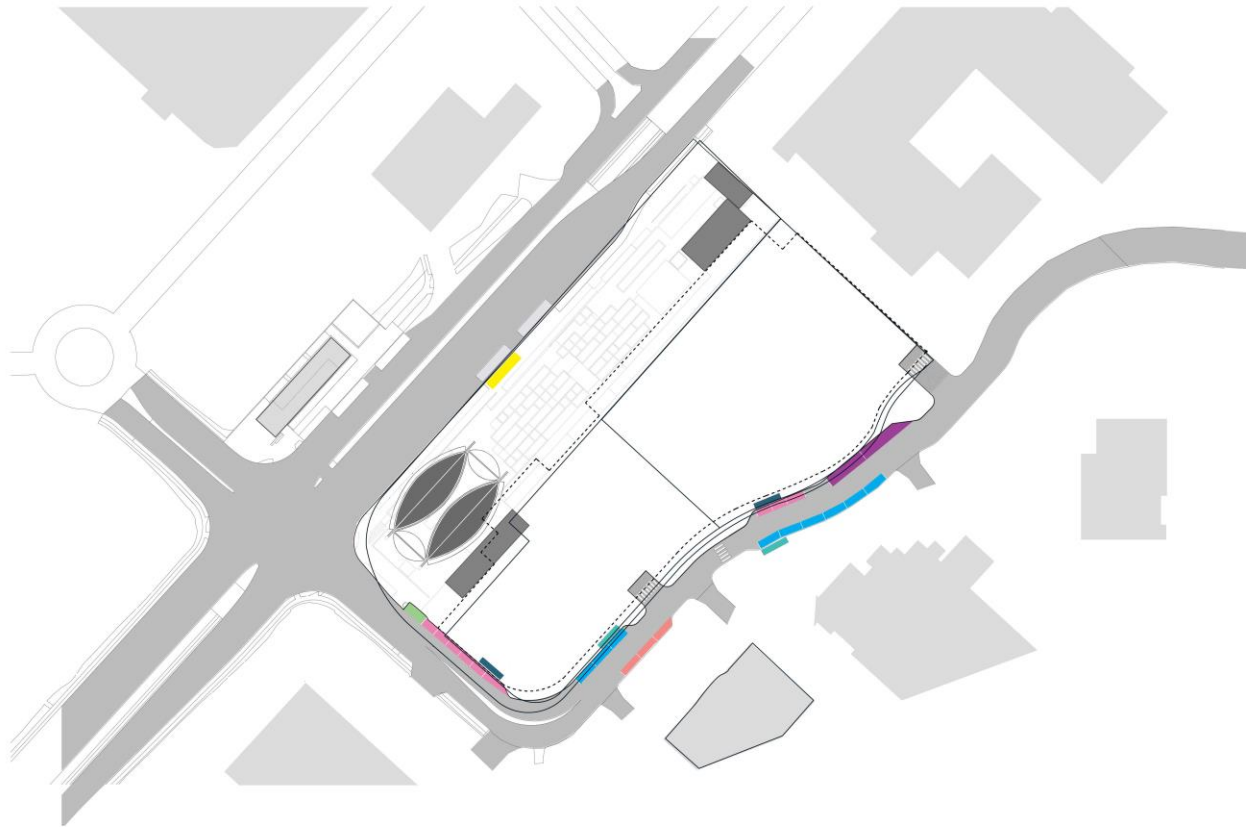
Proposed vehicle access arrangements and facilities at Norwest Station
